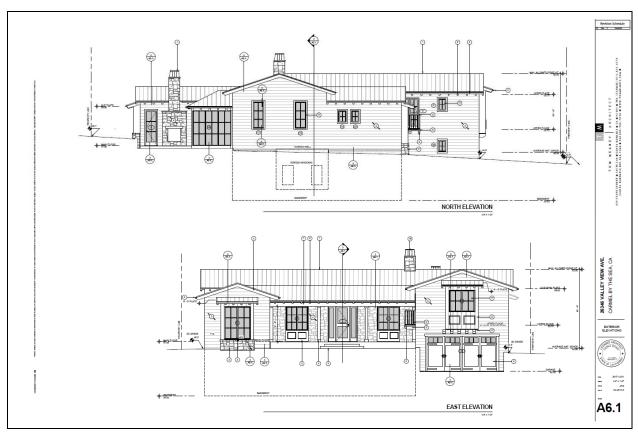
Elevations: Proposed Elevations 26346 Valley View Avenue (north and east exterior elevations).
